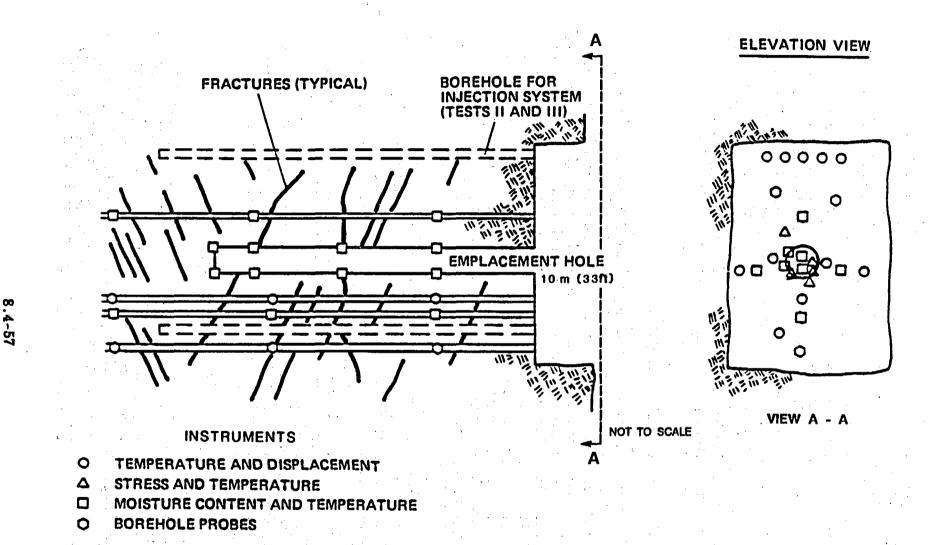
Typical instrumentation array for the engineered barrier field test.
